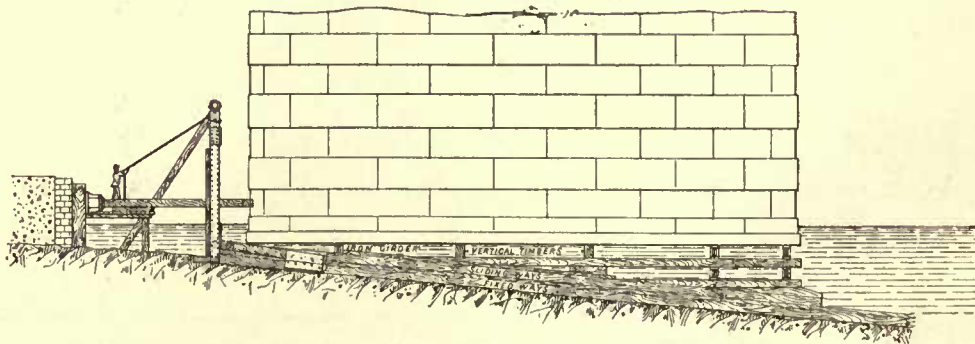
CAISSON AND CRADLE ON LAUNCHING WAYS.
